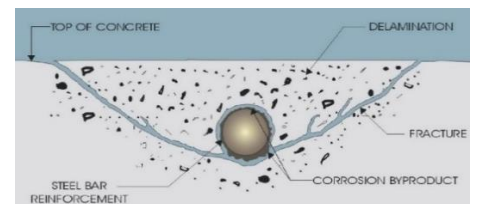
Diagram of concrete delamination at corroded reinforcement.
